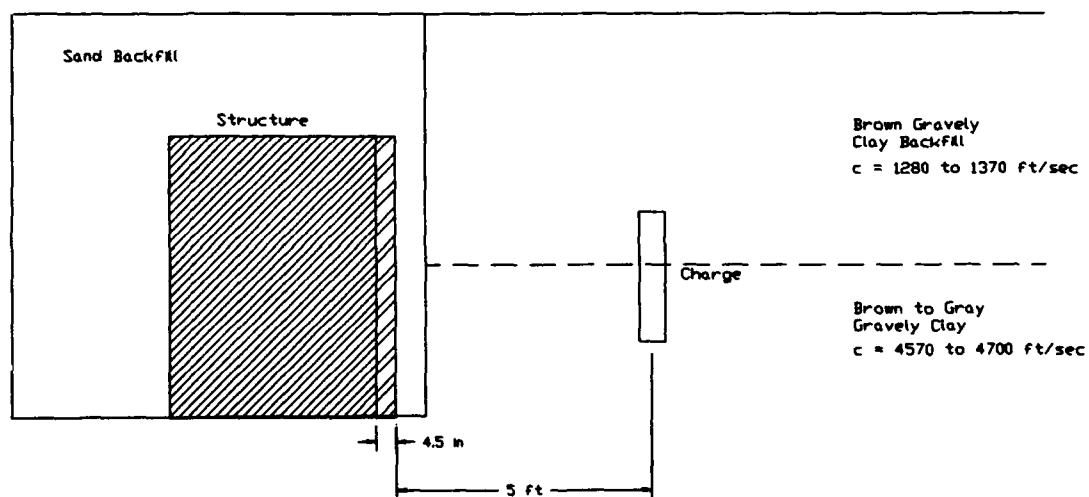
Section through CONWEB 4 test bed, showing in-situ soil properties.
